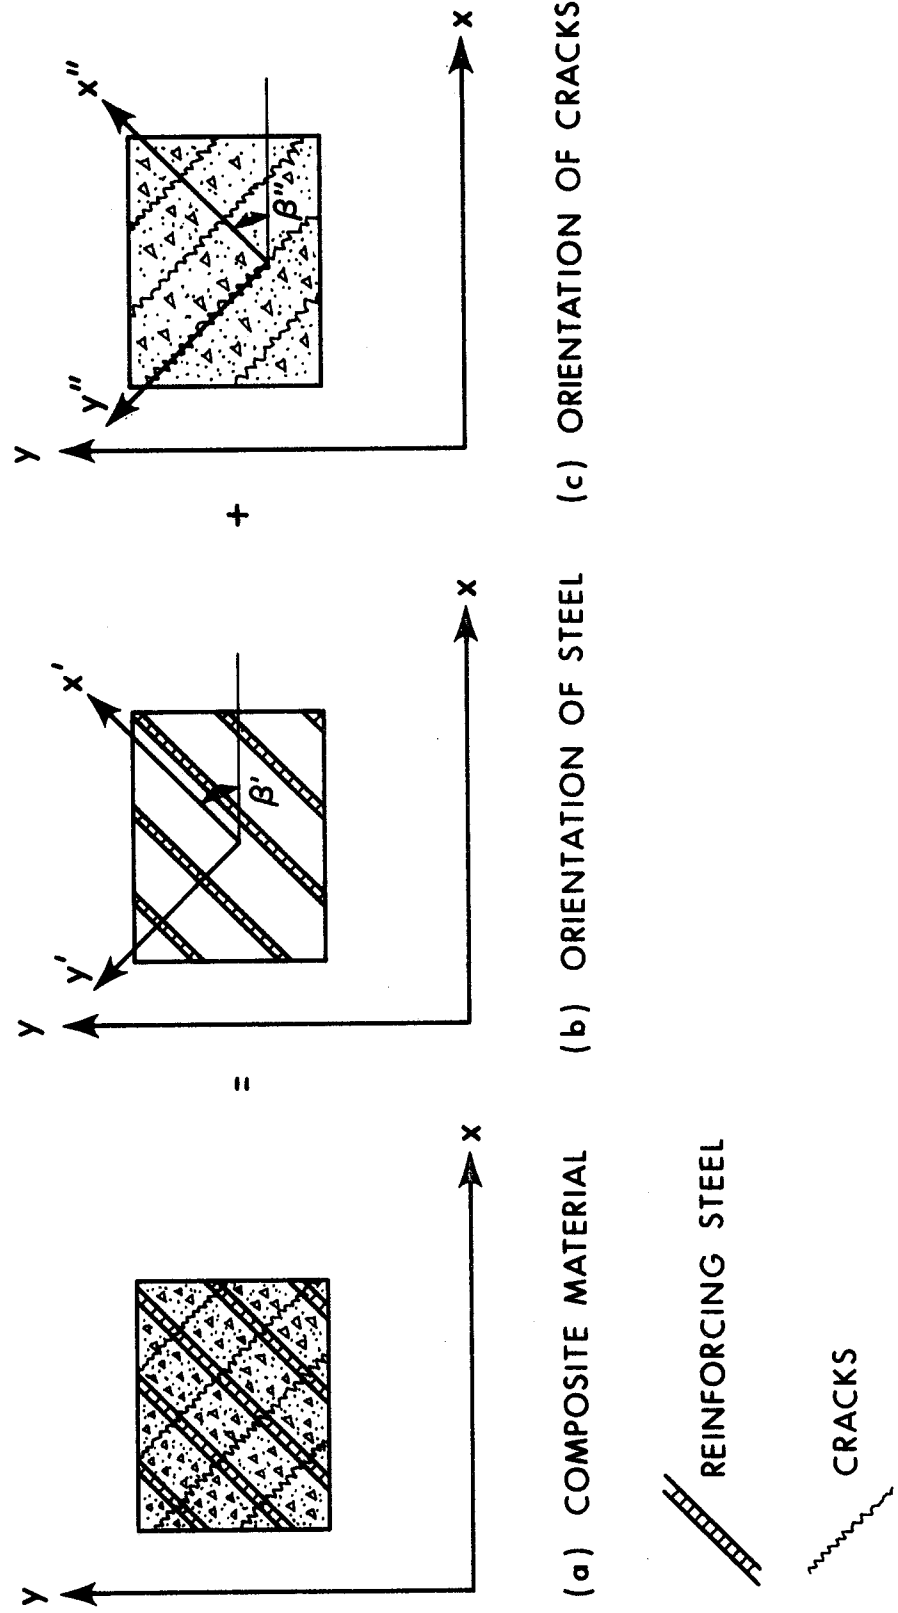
ELEMENT FROM REINFORCED CONCRETE LAYER CONTAINING CRACKS
